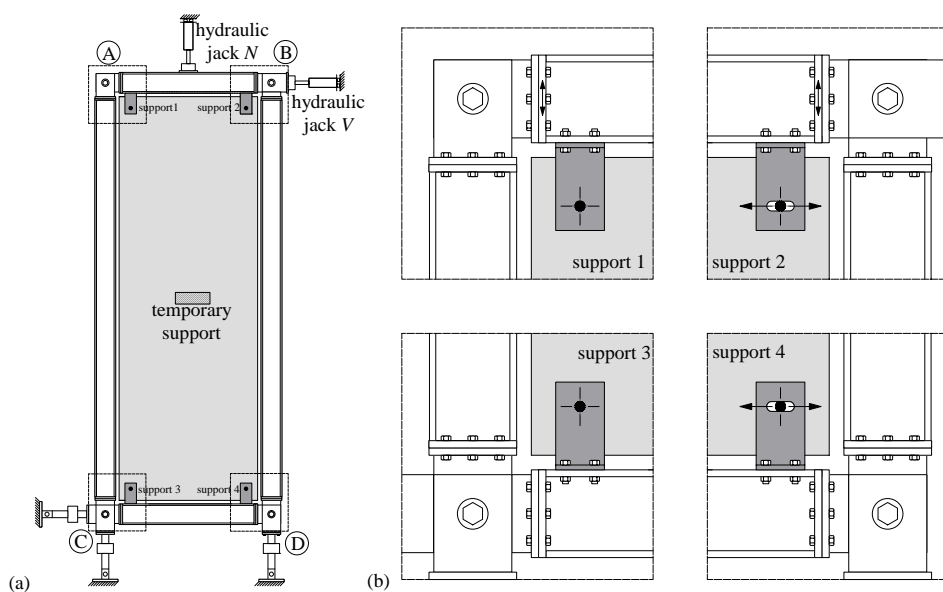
Specimen and testing frame (a) specimen positioning (b) glass supports
